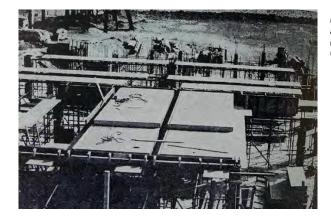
Late 1964 – Work on the concrete and steel foundations of Leslie Hall is underway. (Source: 'School Activities – Leslie Hall', The College Barker, Vol. 6 no. 2 (December 1964): 12)
